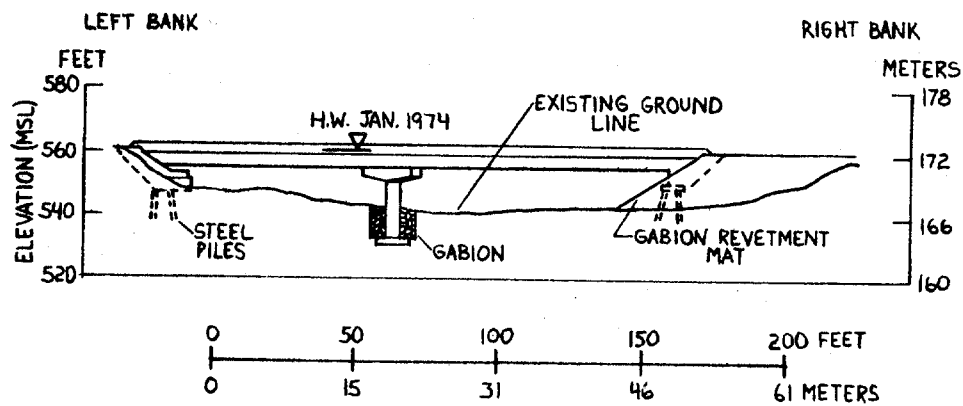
Details of bridge and countermeasures, Klickitat River at SR-142.
